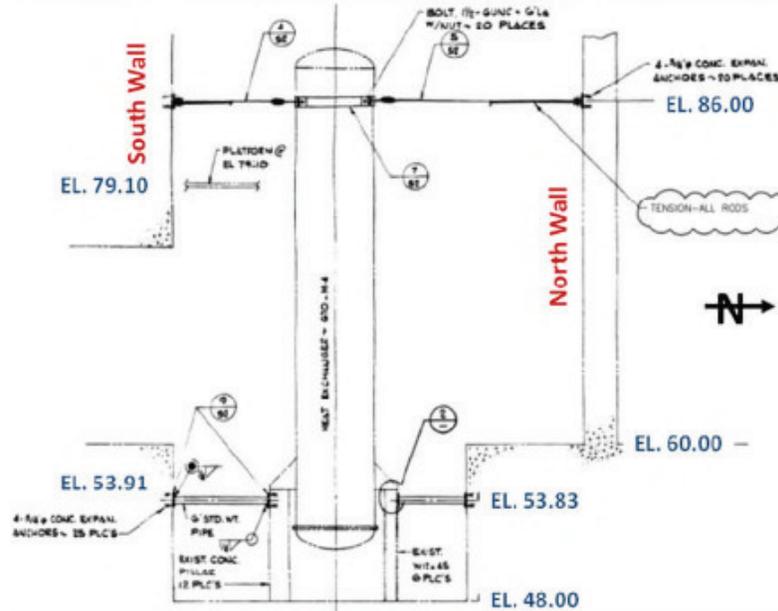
Elevation view of primary heat exchanger looking west, Ebasco (1964)
